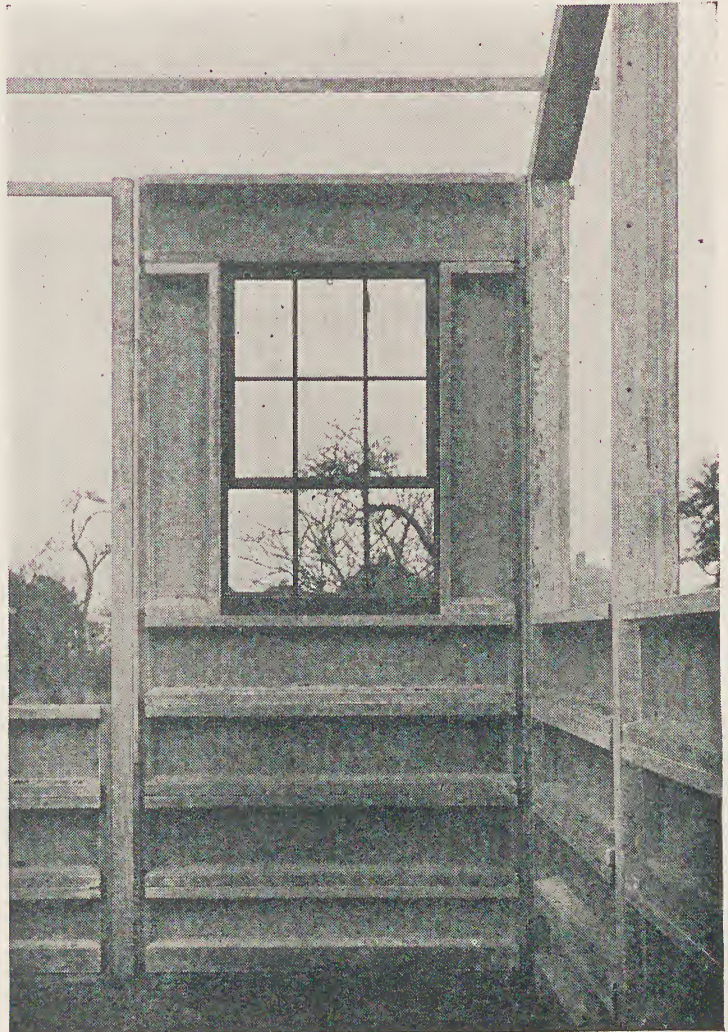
Post and panel wall in pre-cast reinforced concrete units.
